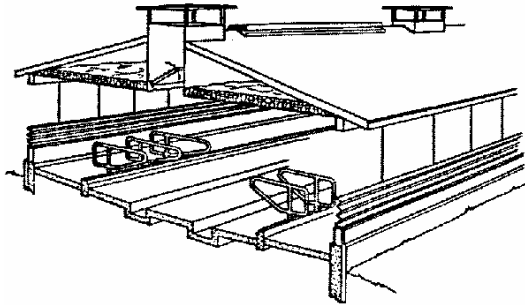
a. Barn with insulated flat ceiling and exhaust stacks or chimneys.
